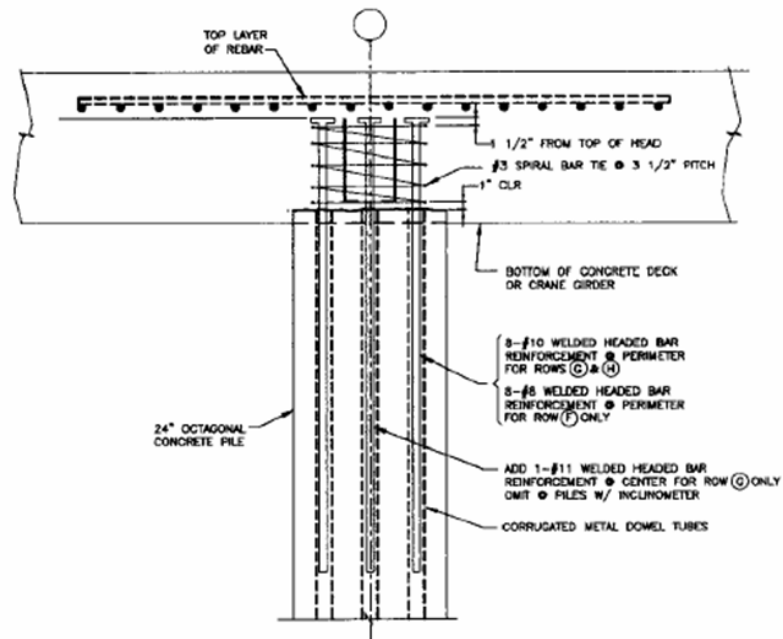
Typical prestressed concrete pile moment connections T-Headed dowel bar (Roader, 2002)
